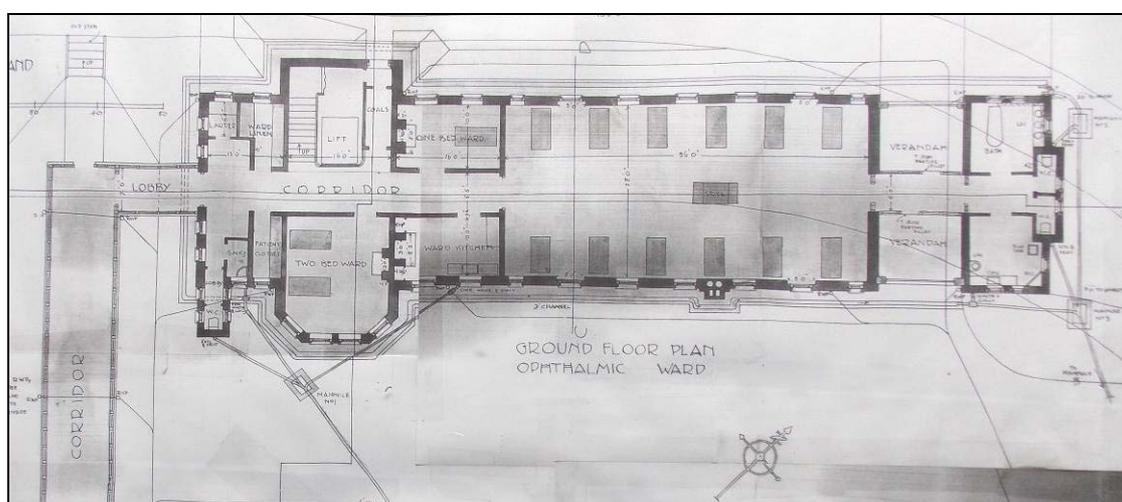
Copy of original architectural drawing of Building 45 showing the ground floor.
